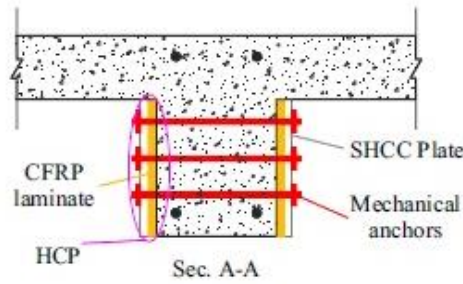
Cross sectional scheme of (HCP) for shear strengthening of RC beams
